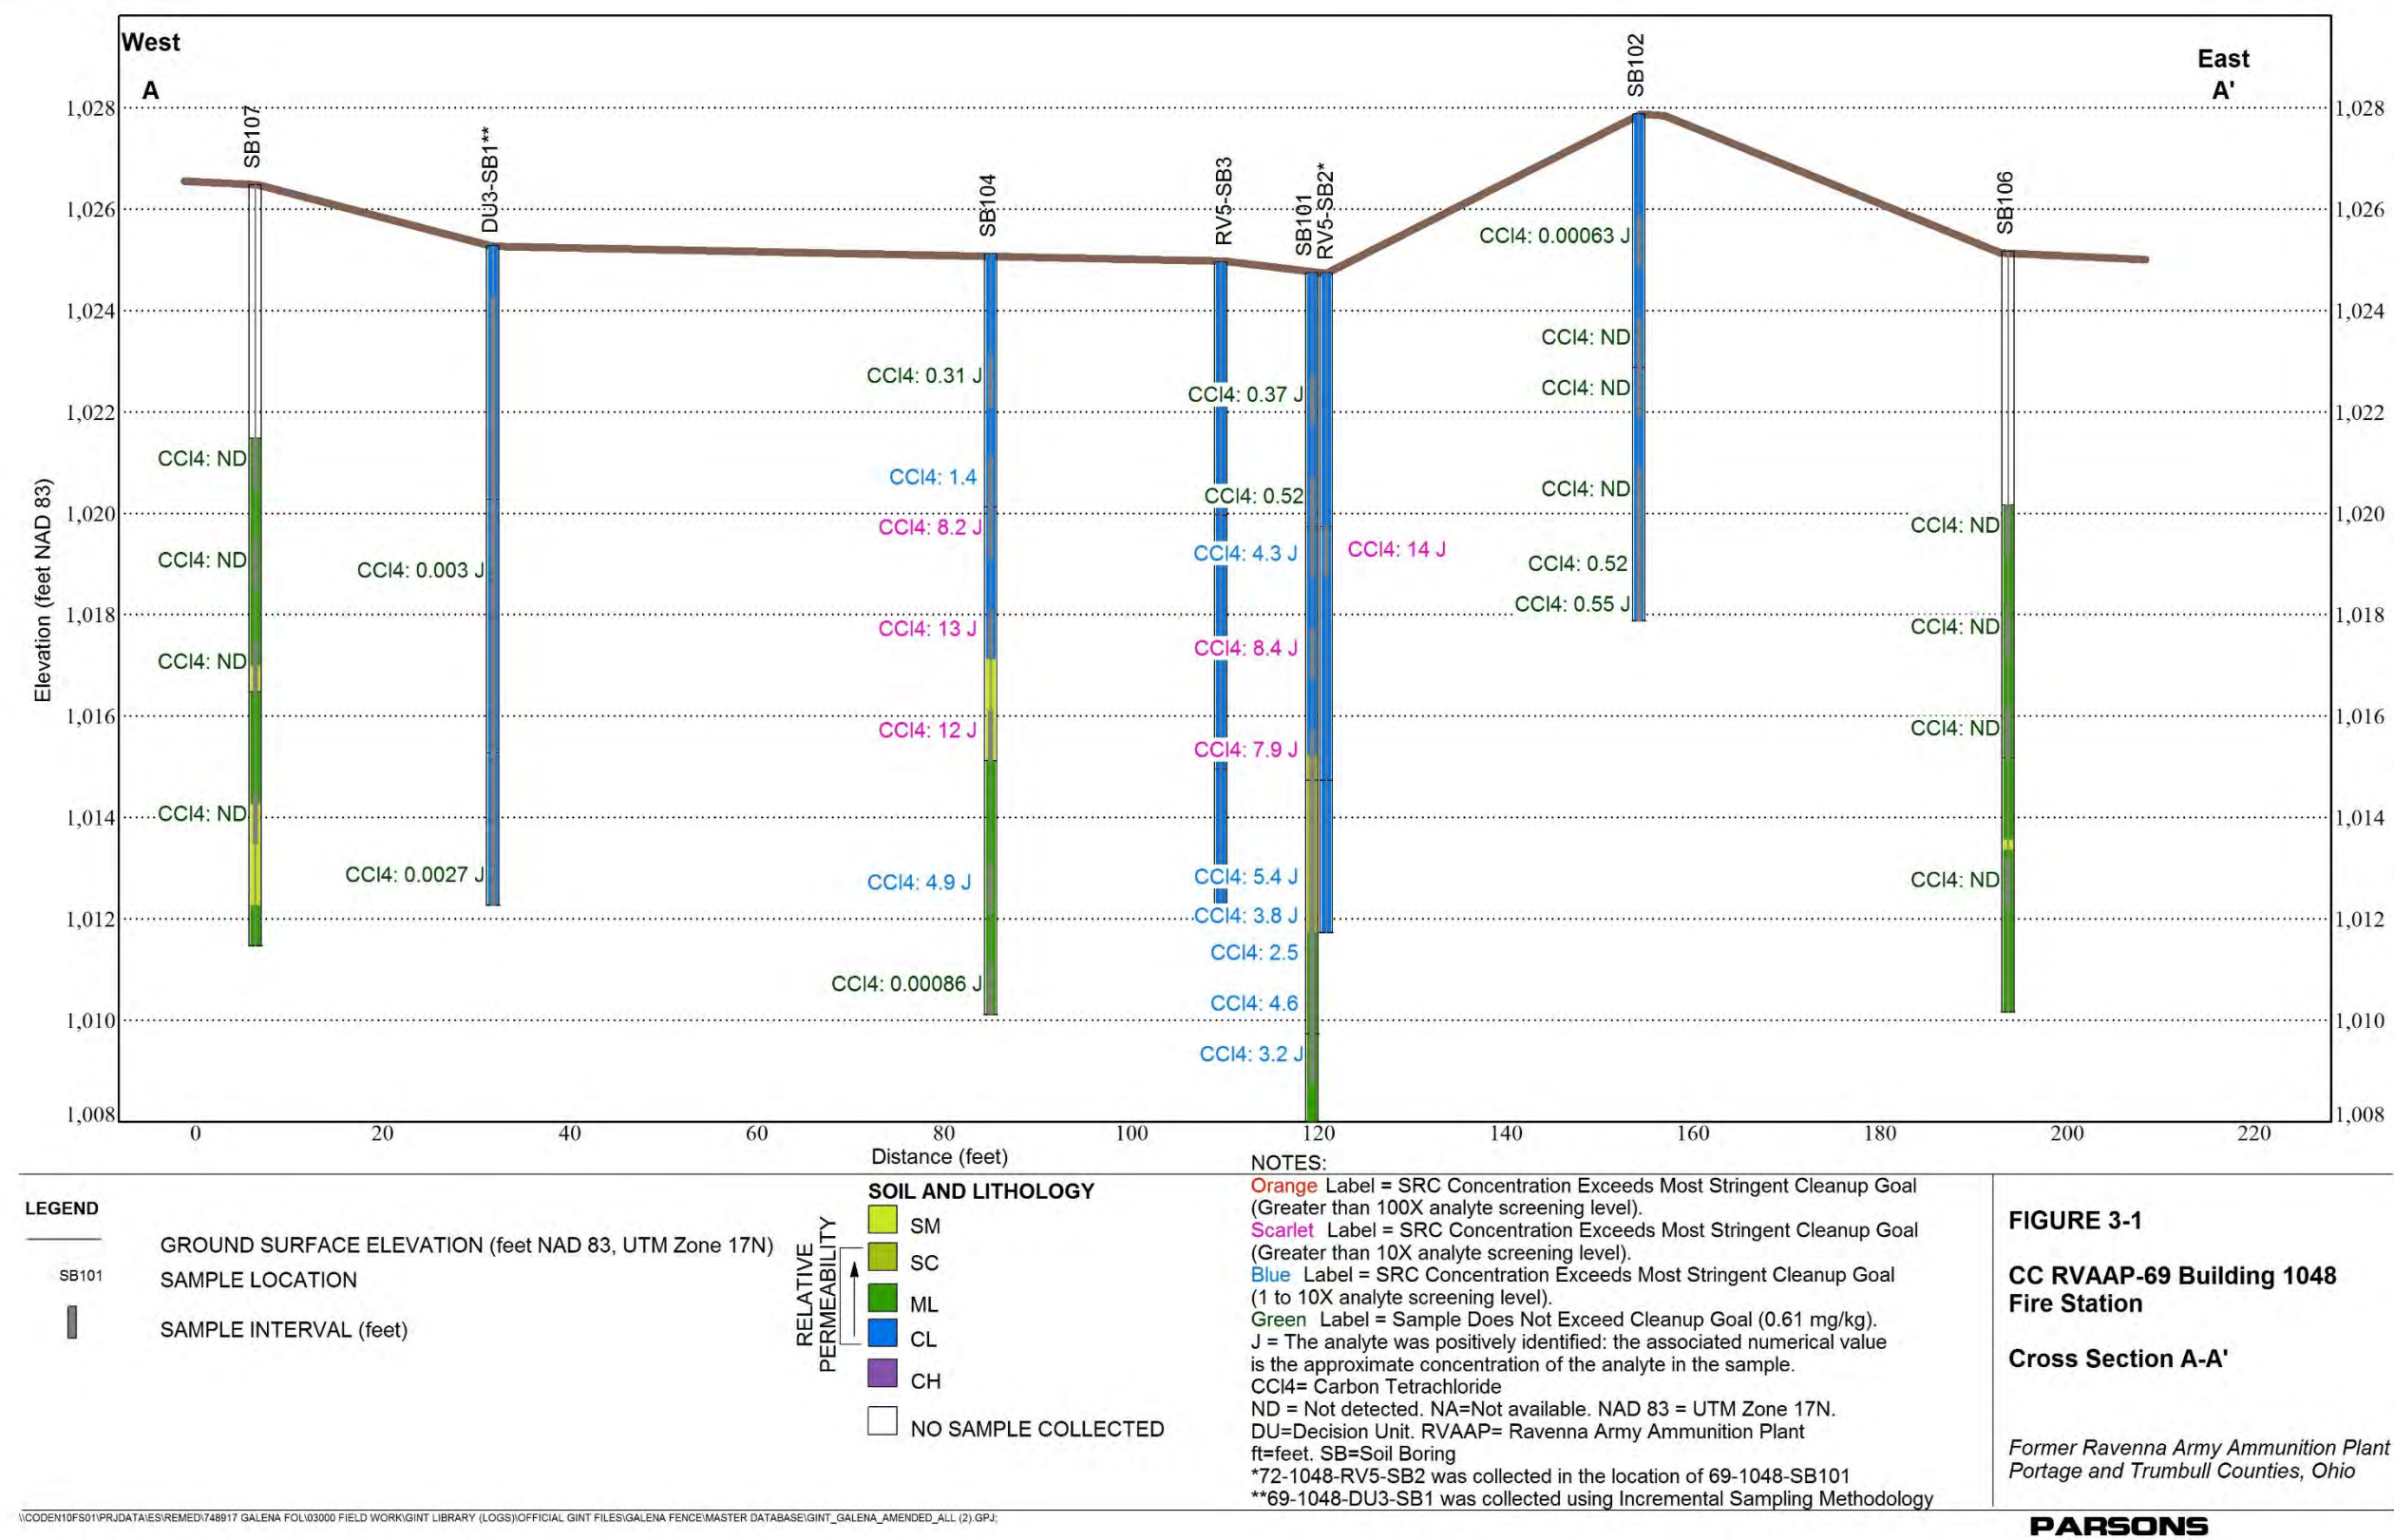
CC RVAAP-69 Building 1048 Fire Station Cross Section A-A'
